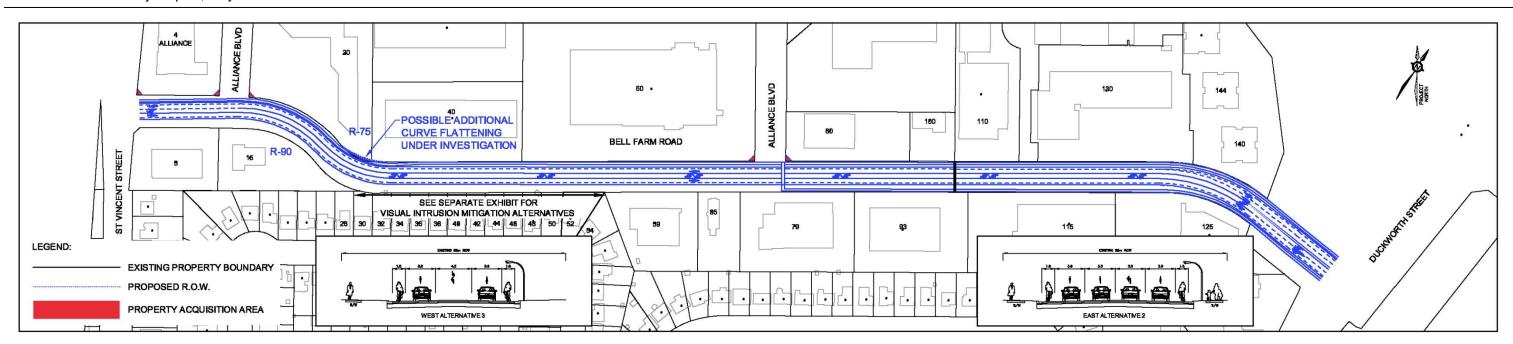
Concept Plan - Bell Farm Road Alternative 3: Constrained ROW
